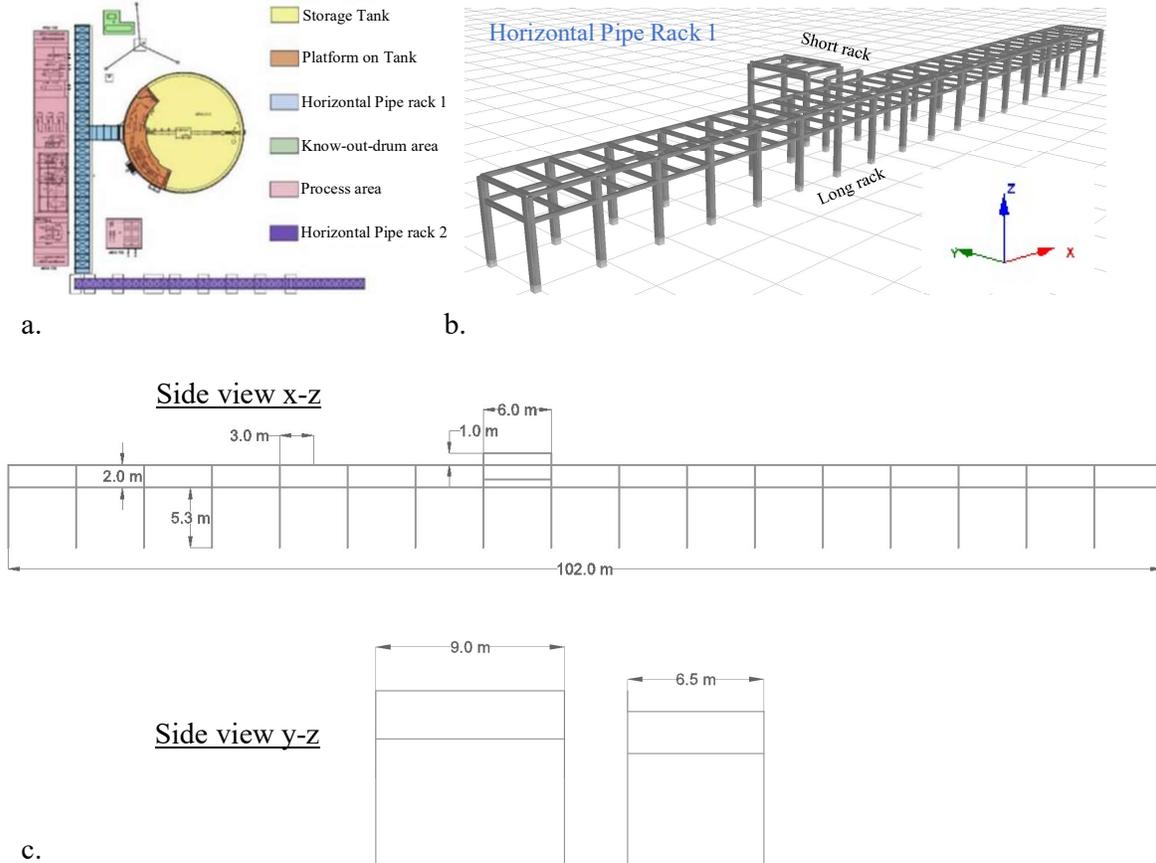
a. LGN terminal layout ([30]), b. RC pipe rack under assessment and c. dimension of the rack
